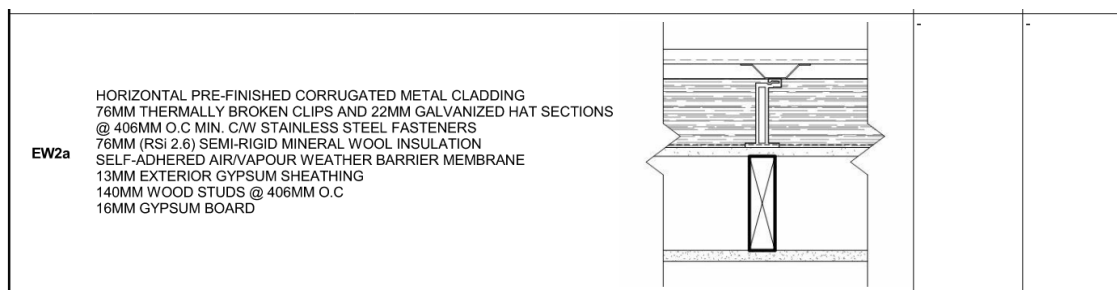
Exterior Wall Type EW2a (Training / EOC Room - East Wall)
